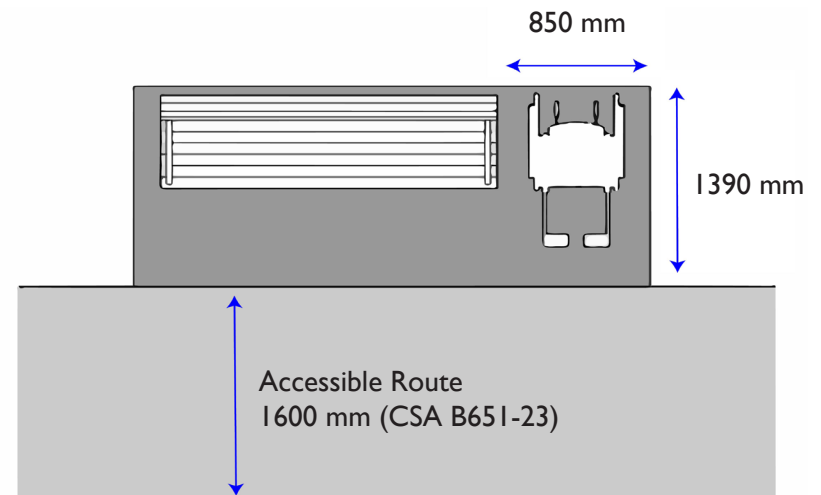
Minimum construction measurements for accessible bench seating along a barrier-free path referencing [Recommendations on Accessibility Standard in the Built Environment: Phase 2 \(Nova Scotia, 2021\)](#).
